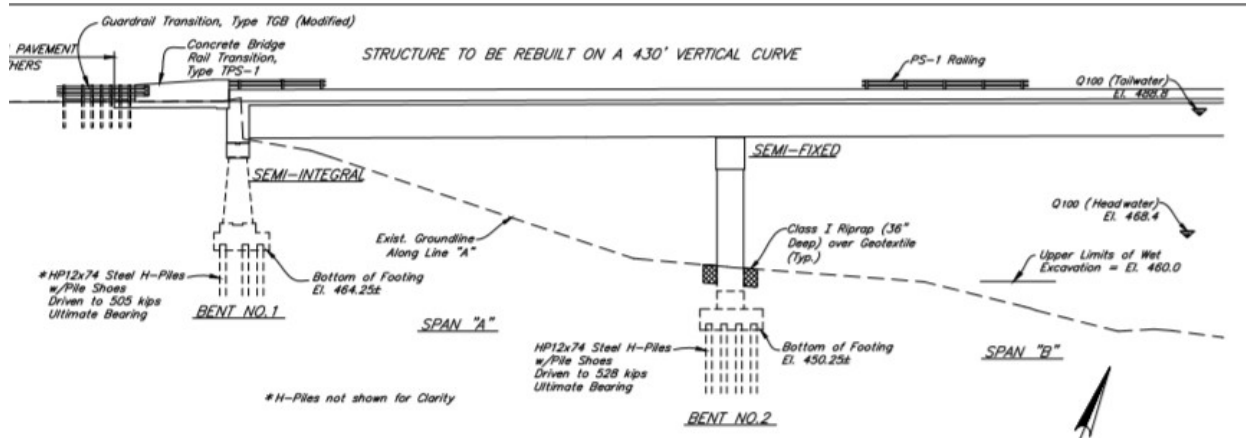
Elevation View of the Bridge—Span 1 and 2 (NBI 18790) (2014)
